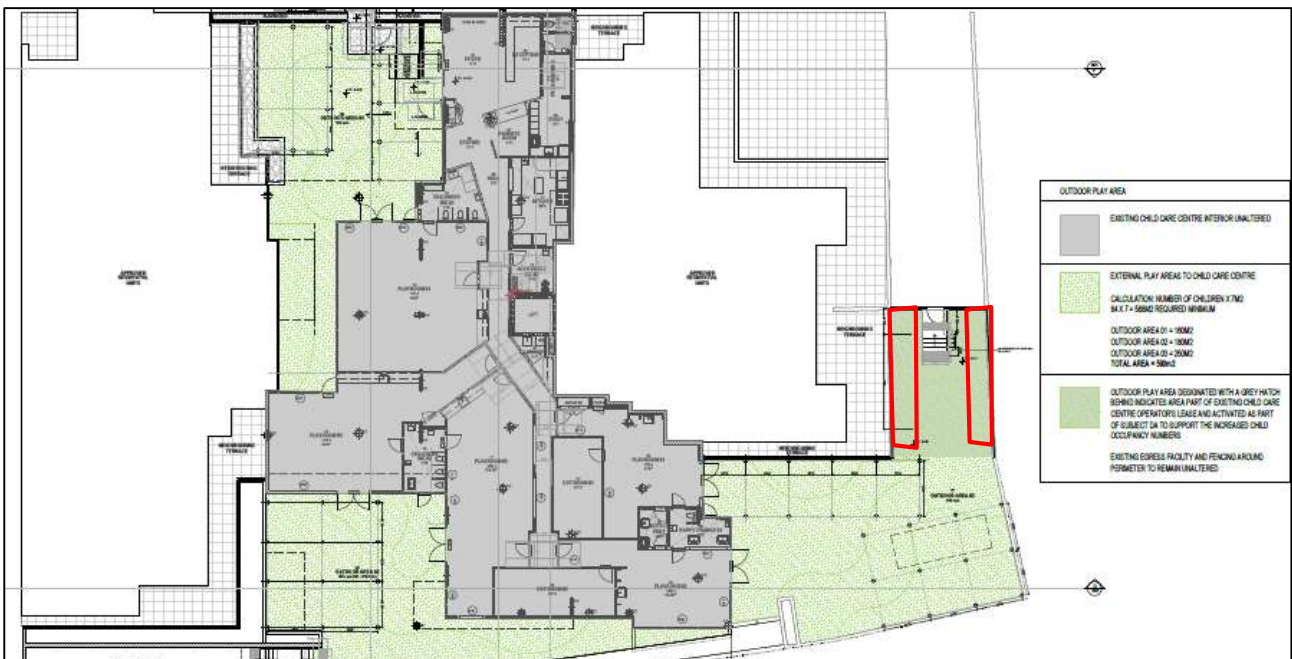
Proposed site plan including proposed awning extension outlined in red.
